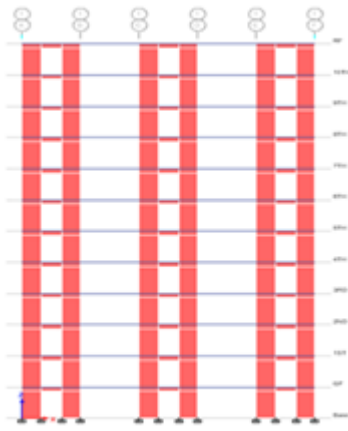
Elevation of Coupled Shear Wall Structure Model 05
